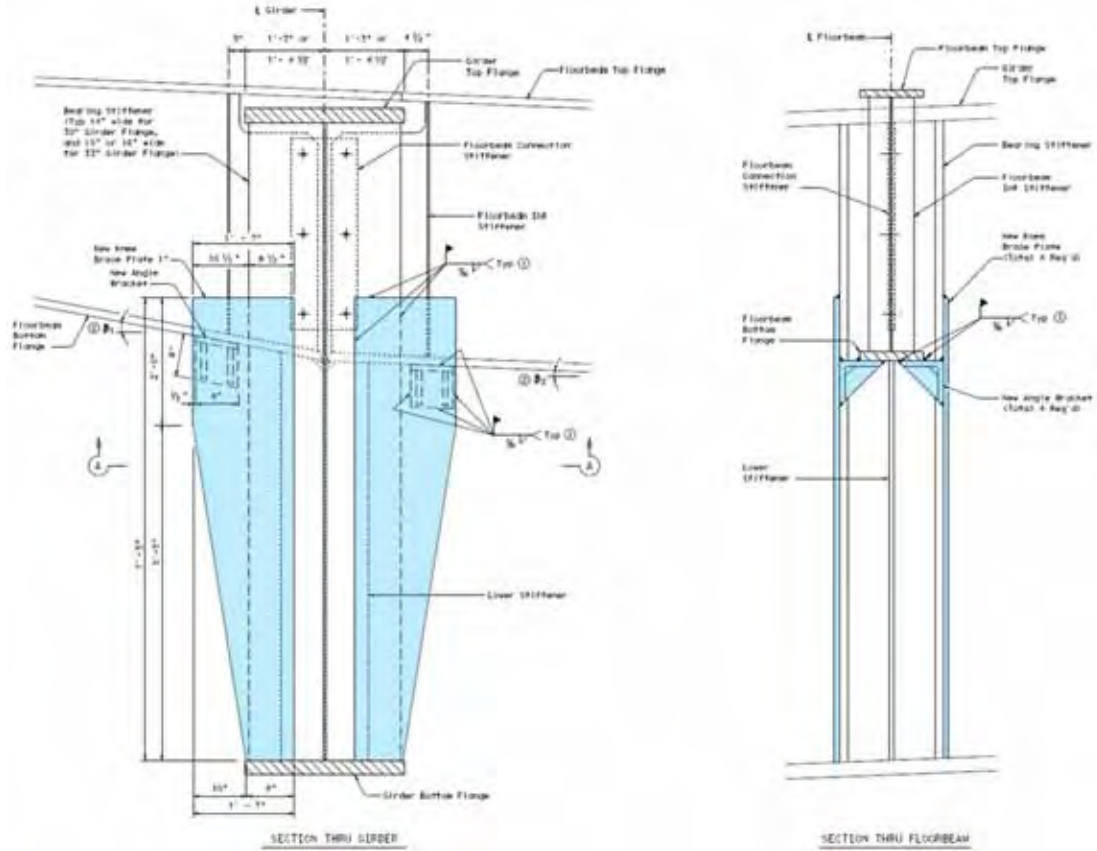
Detail Showing Proposed Retrofit Brace Plates and Brackets
